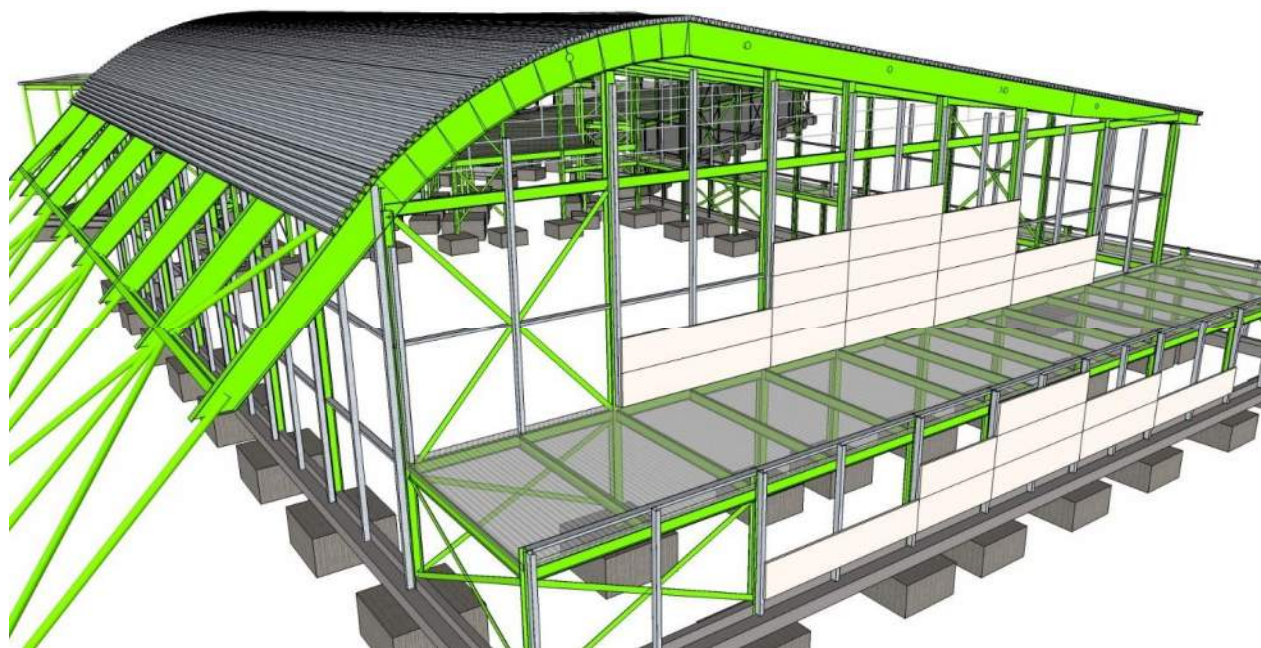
Suggested layout for Kingspan KS100 system with vertical secondary steelwork
